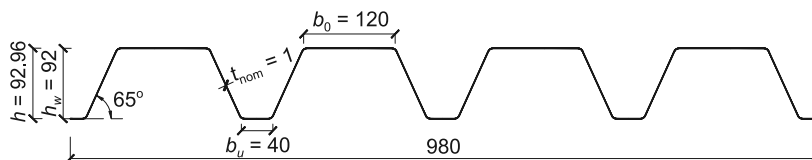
The cross-section of a trapezoidal sheet 92 mm high
